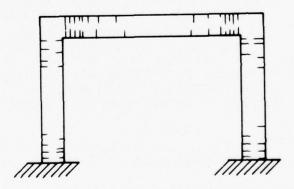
Failure mechanisms for reinforced concrete frames.
